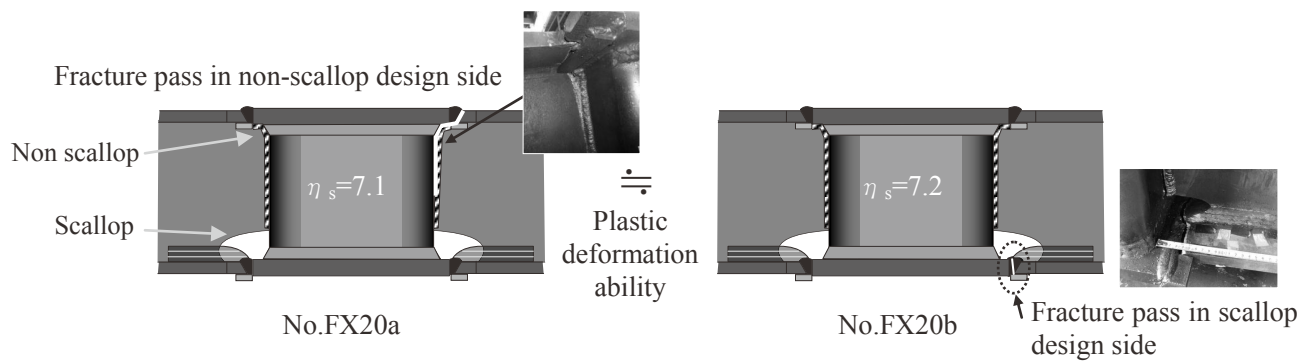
Fracture passes of each same assemblies of leg length $T_D=20\text{mm}$ overlay welding around toe of scallop (Ref. Fig.5.13)
